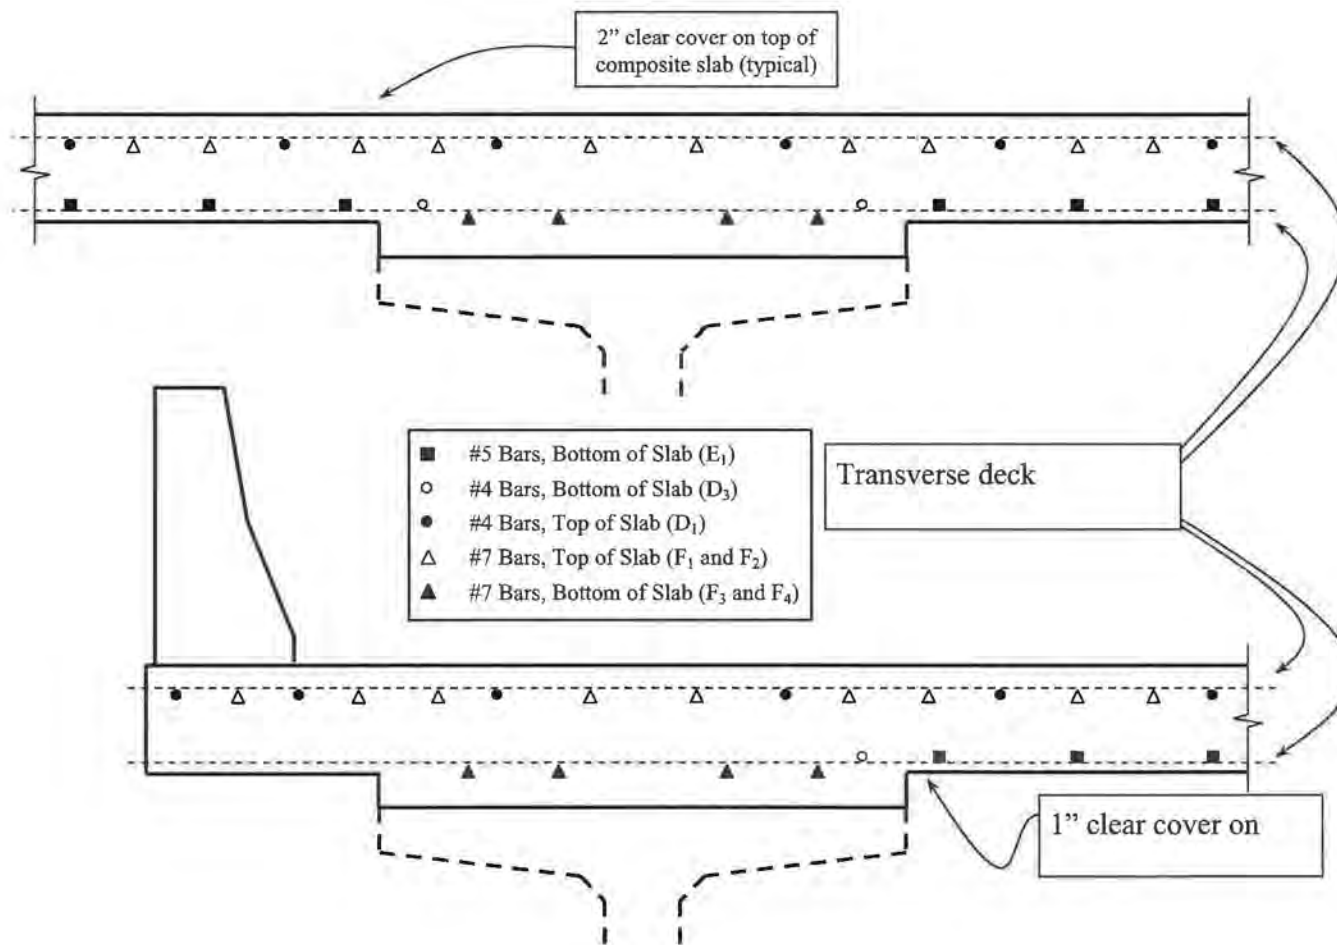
Longitudinal Mild Steel Reinforcement in the Deck Slab
